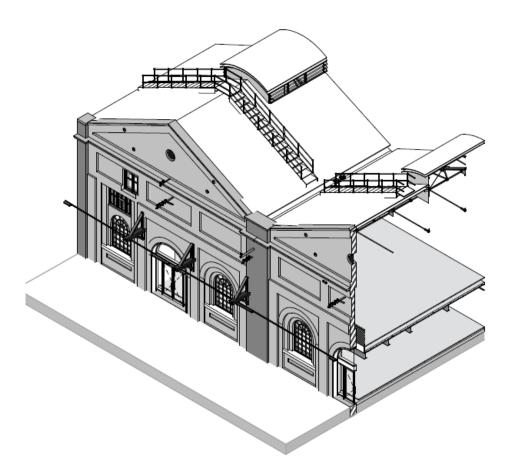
3D view of the proposed roof maintenance access system Source: Sissons Source: Sissons
